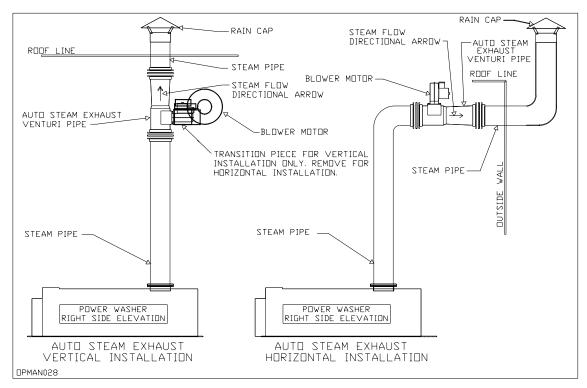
11: Auto Steam Exhaust (ASE) Piping and Blower Installation Configurations
